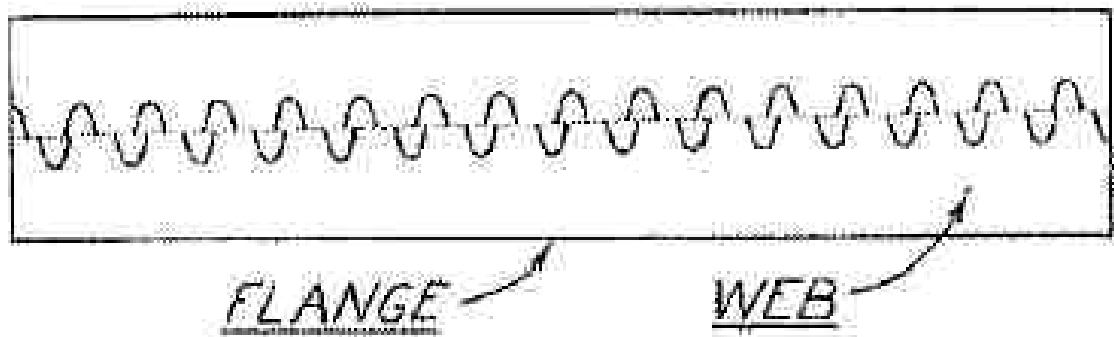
Cutting rib profile in floor beam web to produce pair of floor beams (reproduced from Smylie, 1966)
